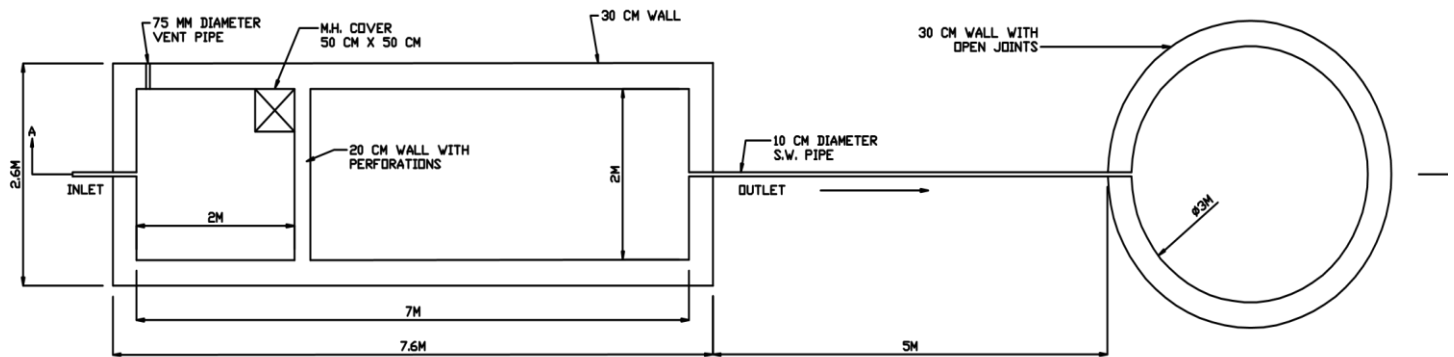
(a) Soak pit & Septic Tank Plan
